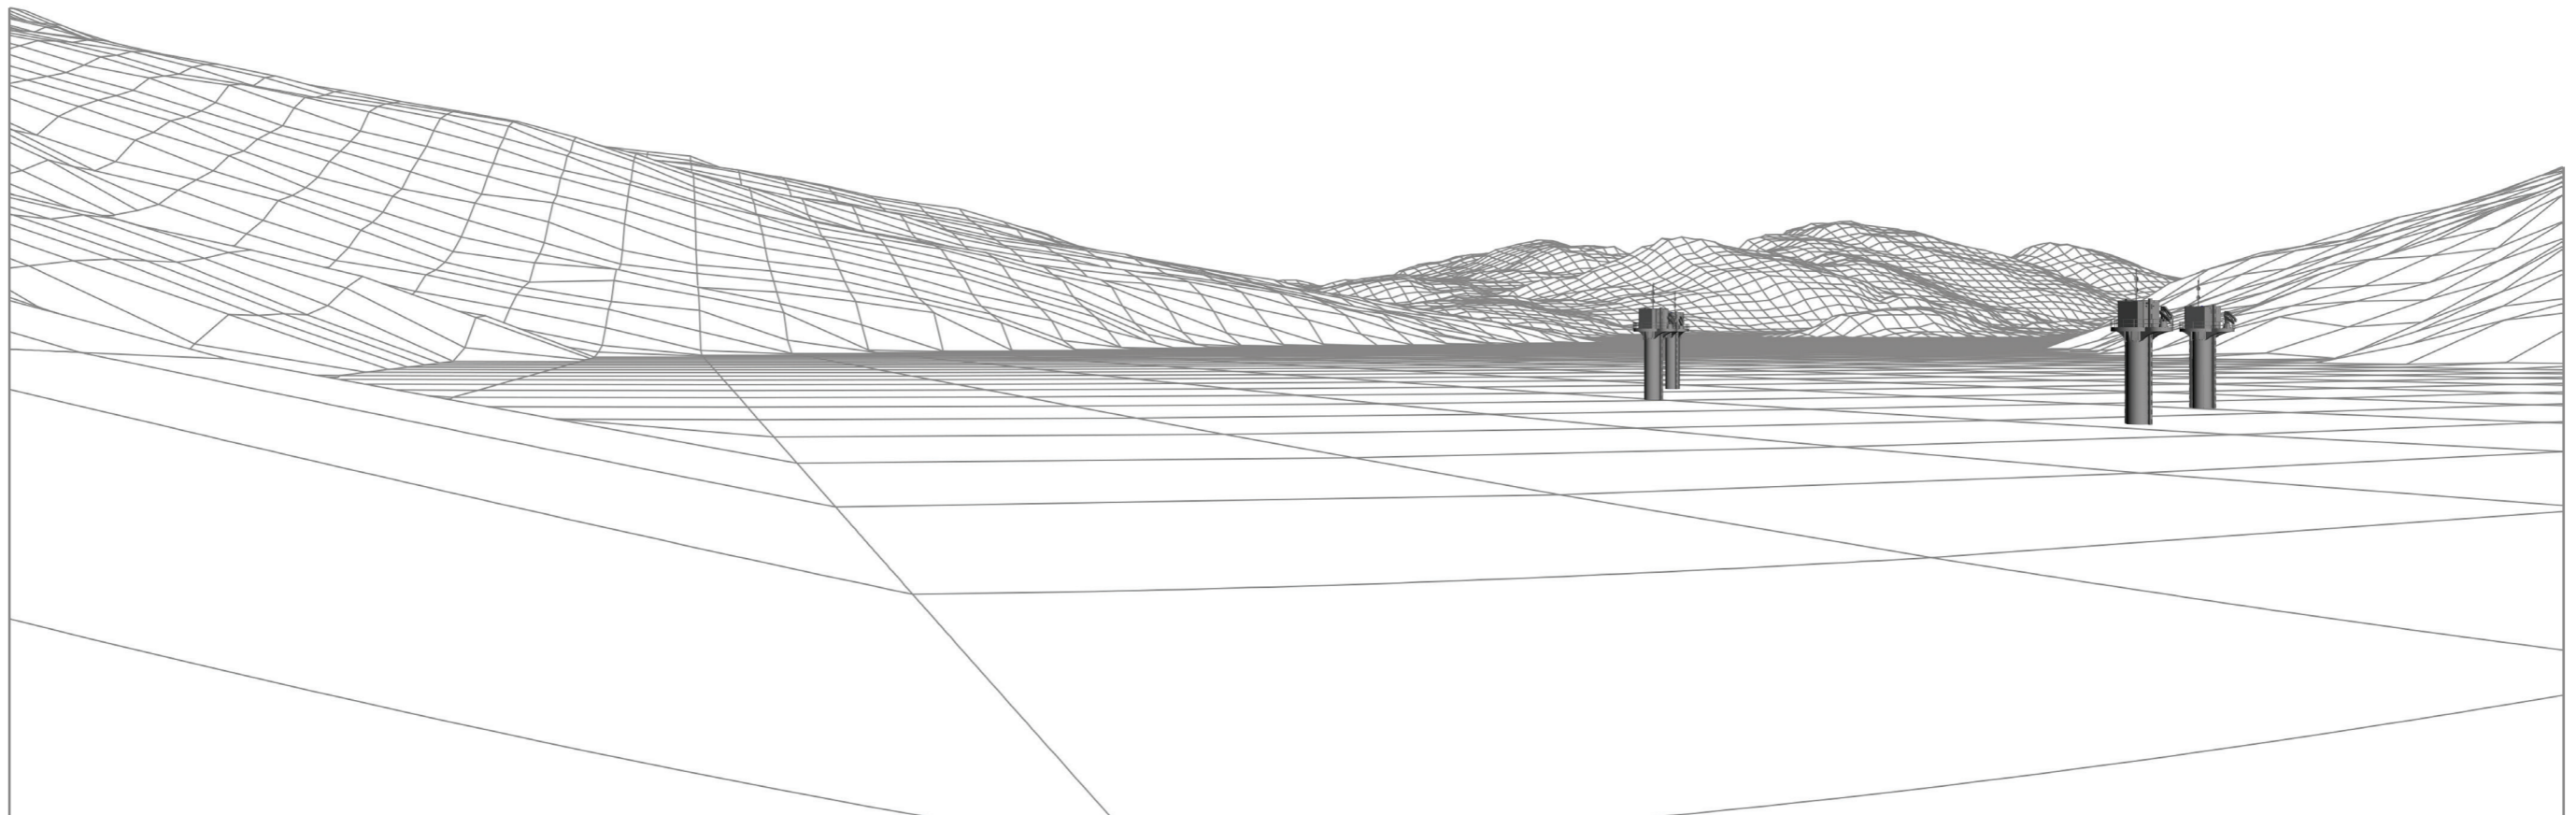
VIEWPOINT 1 FERRY CROSSING WEST
